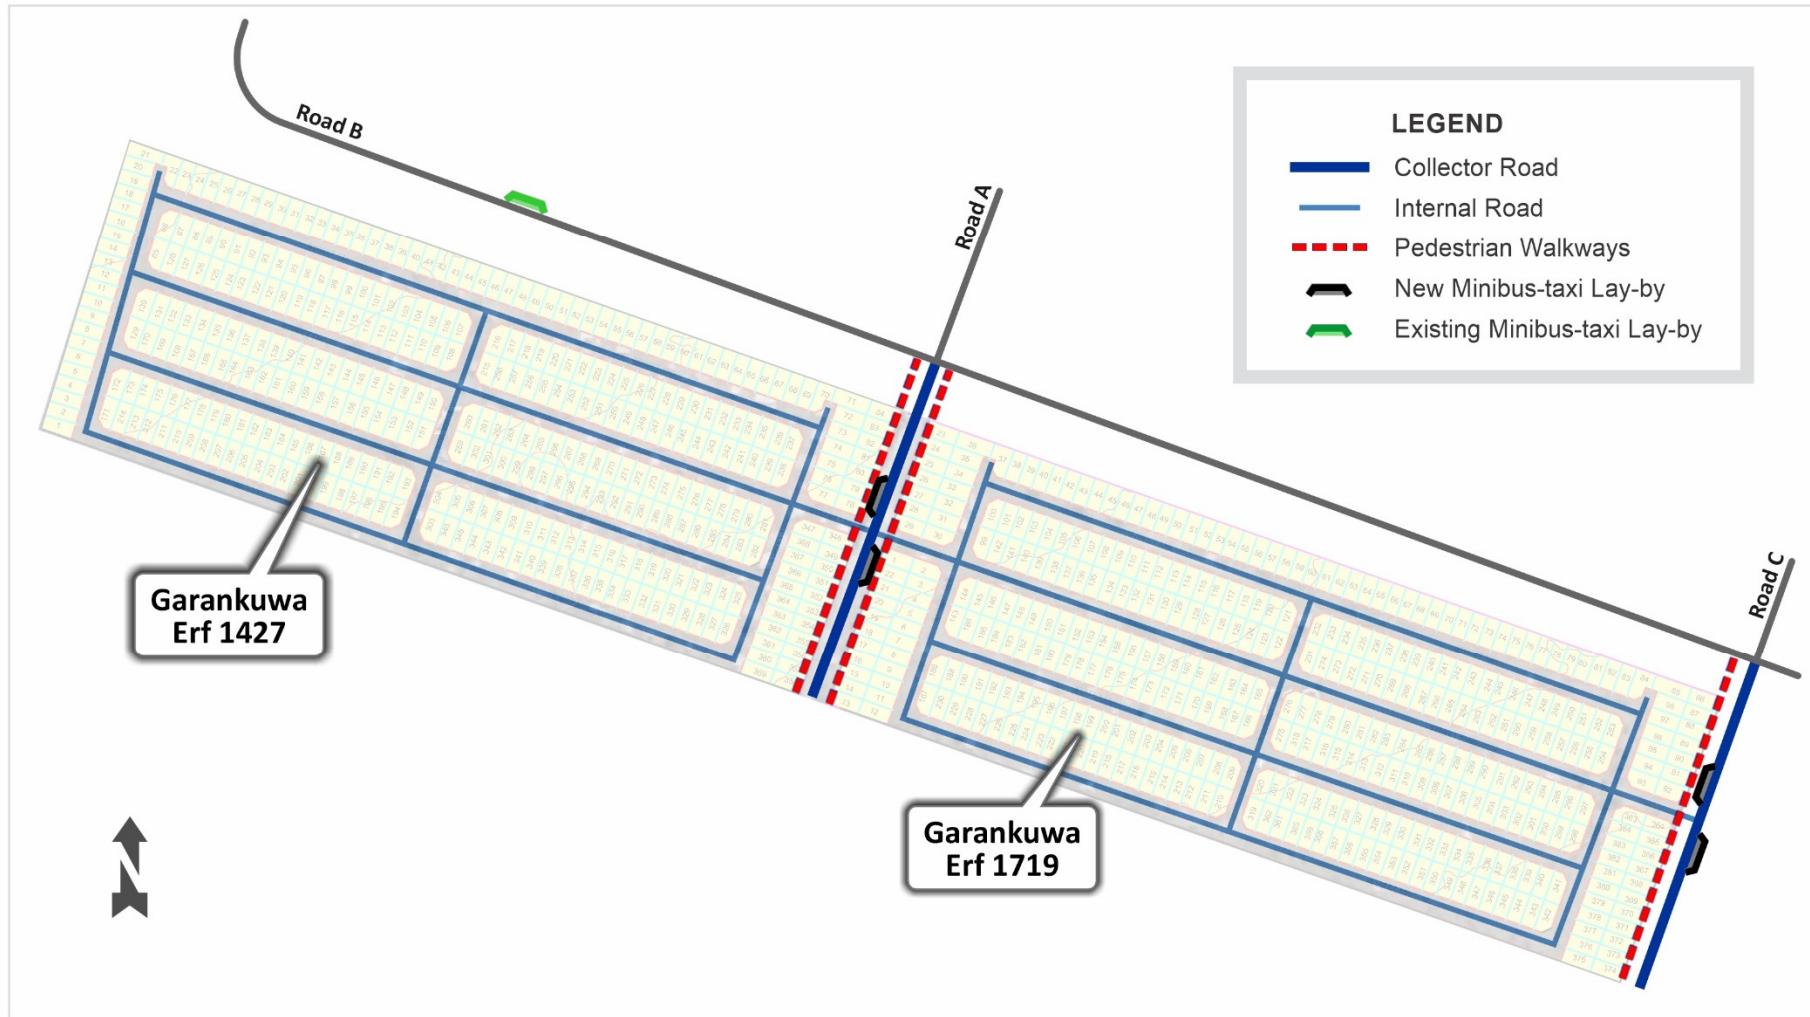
Required Road Construction Including Public Transport and Pedestrian Facilities
